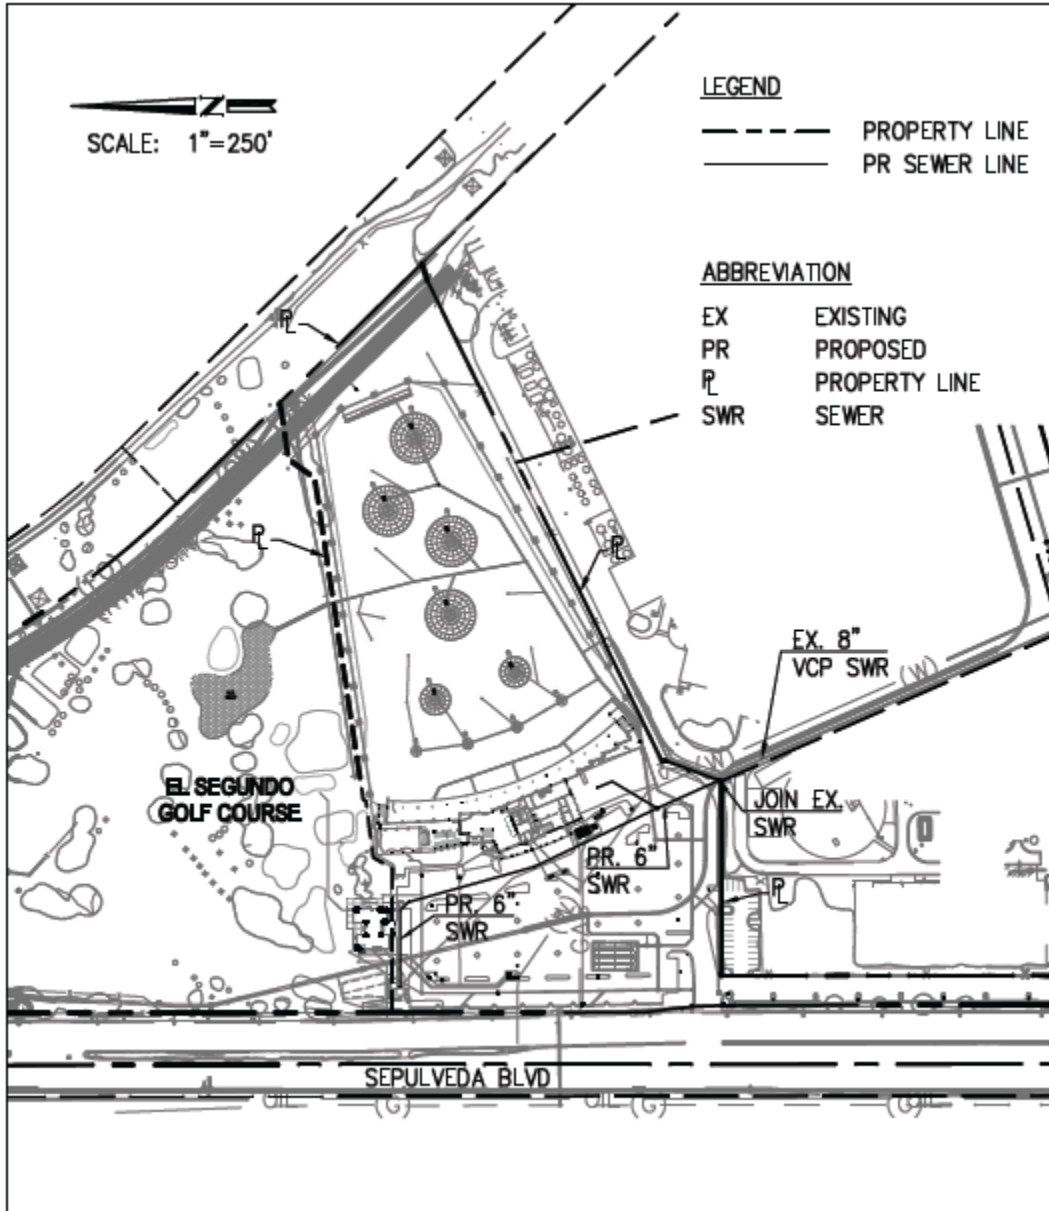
CONCEPTUAL SEWER PLAN
